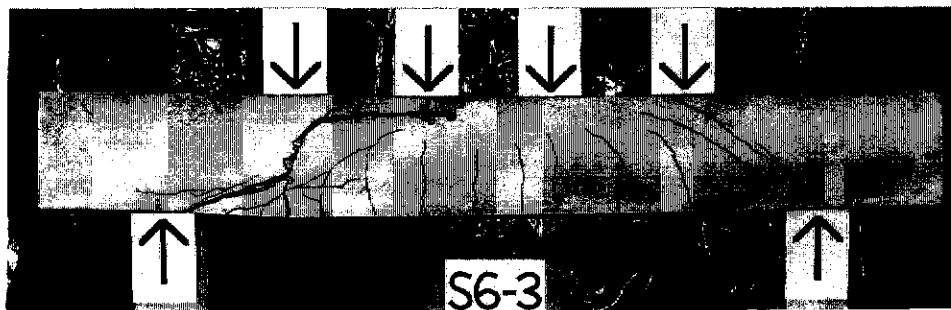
Crack Pattern of the Front Face of Beam S6-3
